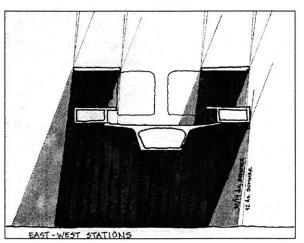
East-west oriented stations shade larger space and immediately under guideway.
